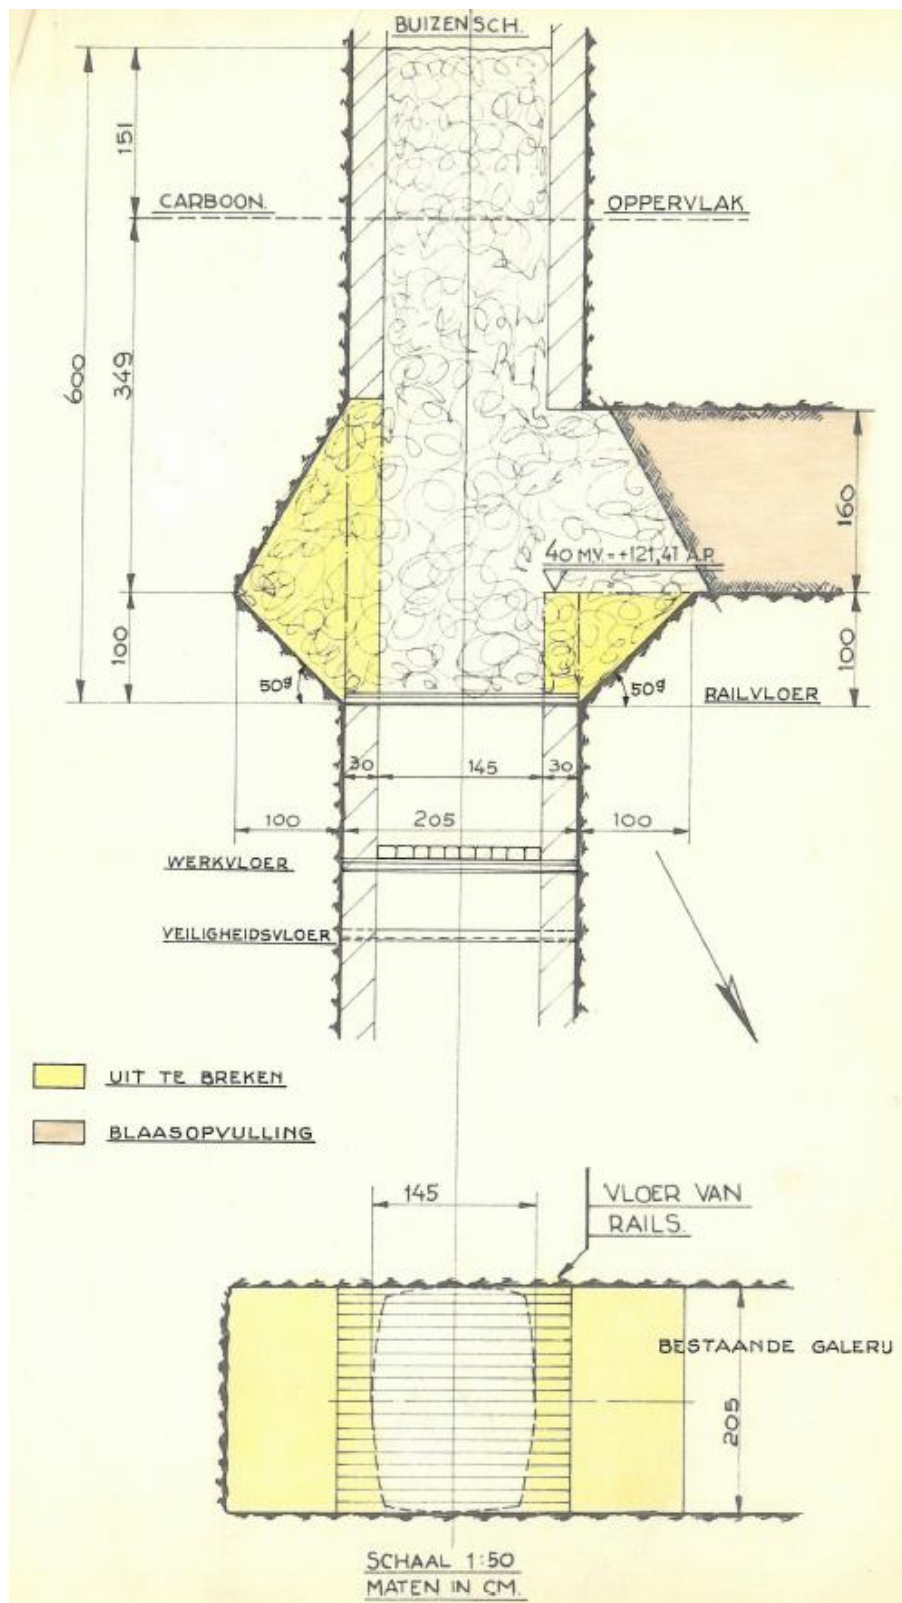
Sectional drawing of the shaft barrier in the Buizenschacht /26/
